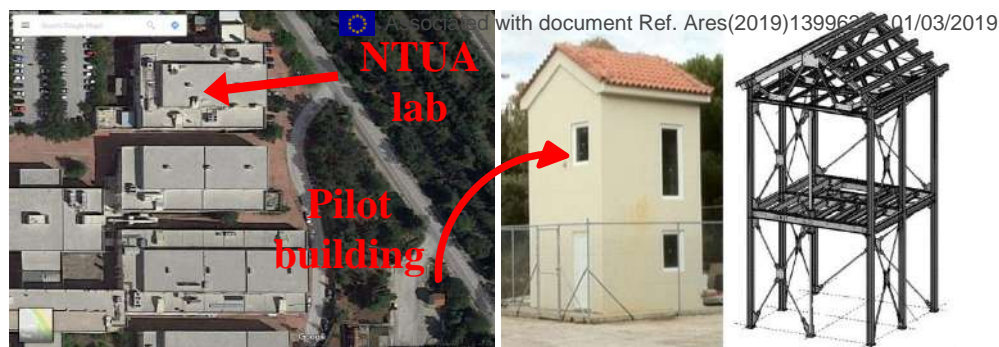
Left: Satellite view of the building and the NTUA lab. Right: Southwest view of the building and its steel frame
